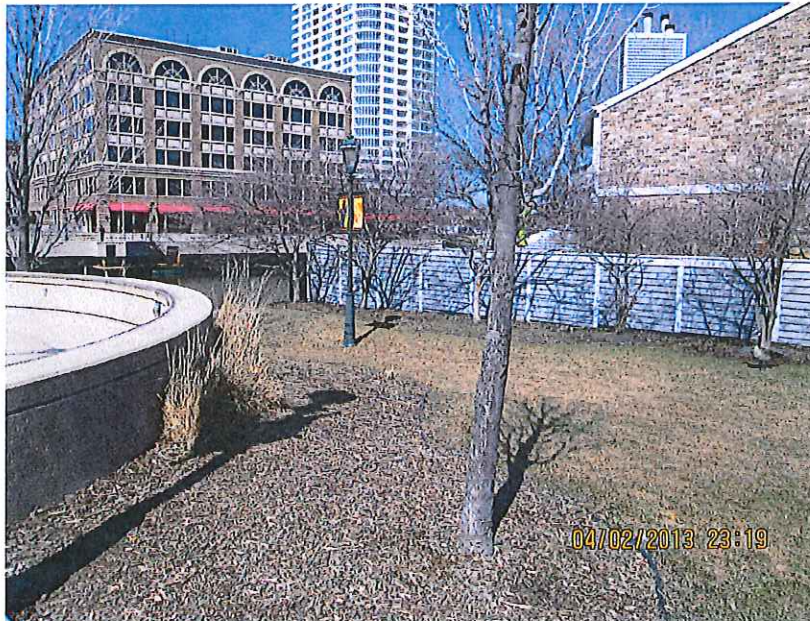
Final site conditions. Structures, topsoil, and vegetation serve as a barrier. (looking northwest on northern portion of site.)
